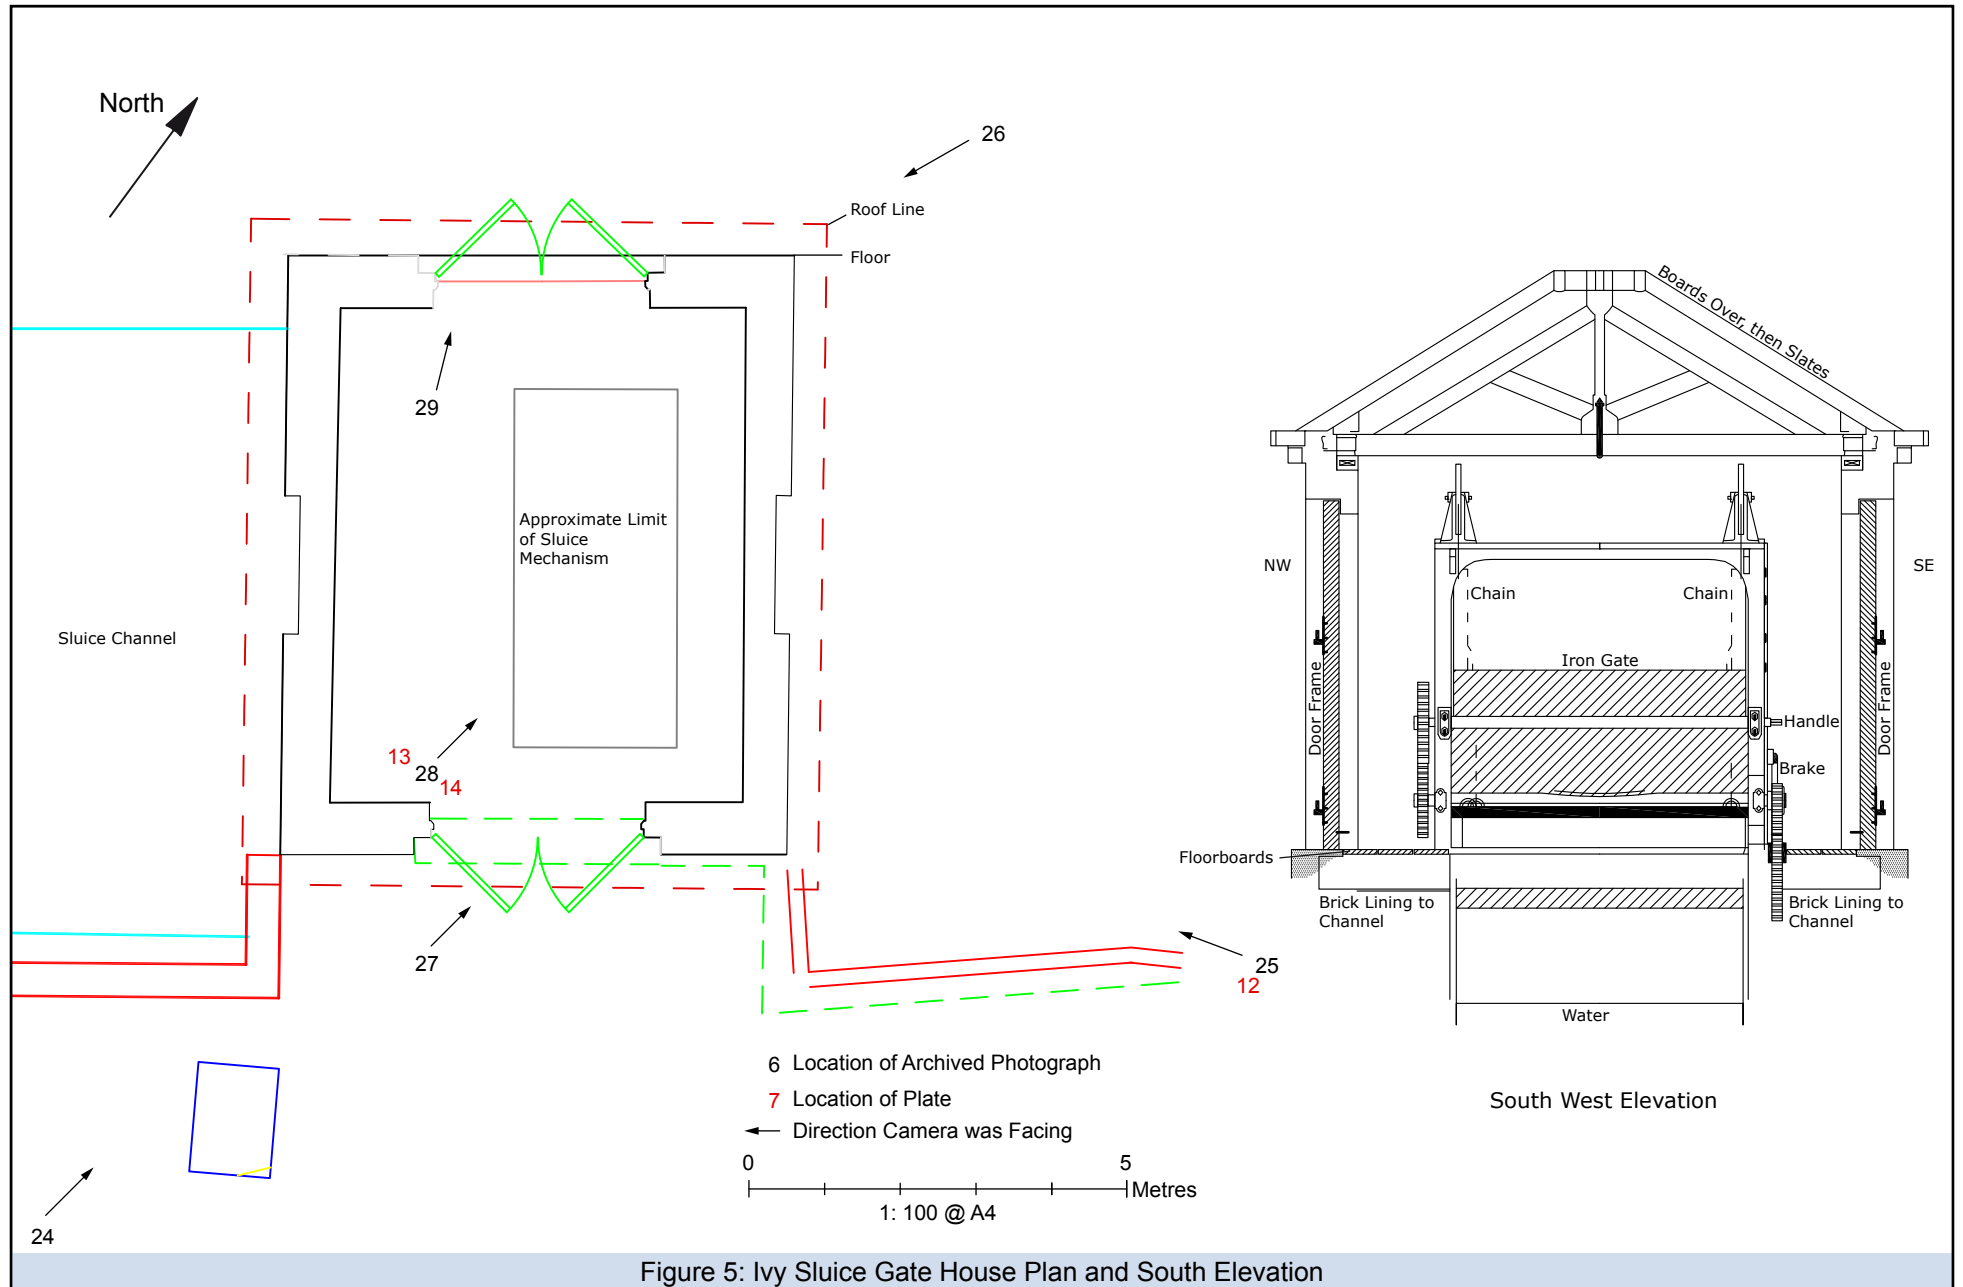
Ivy Sluice Gate House Plan and South Elevation
